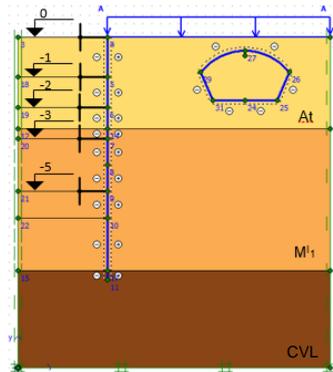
Cross section in the BC elevation, transverse to ML tunnel
